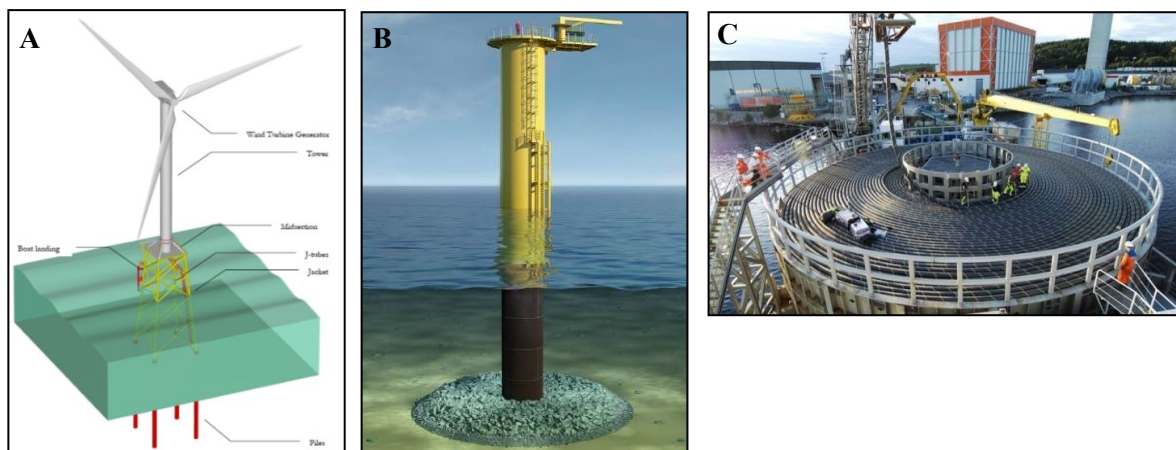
Jacket foundation (A) Monopile foundation (B) and the Installation of cables (C)
